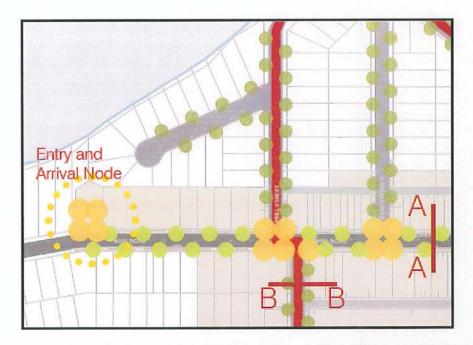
Extract of Toukley Town Centre Public Domain Plan showing Toukley Gardens Park node.
